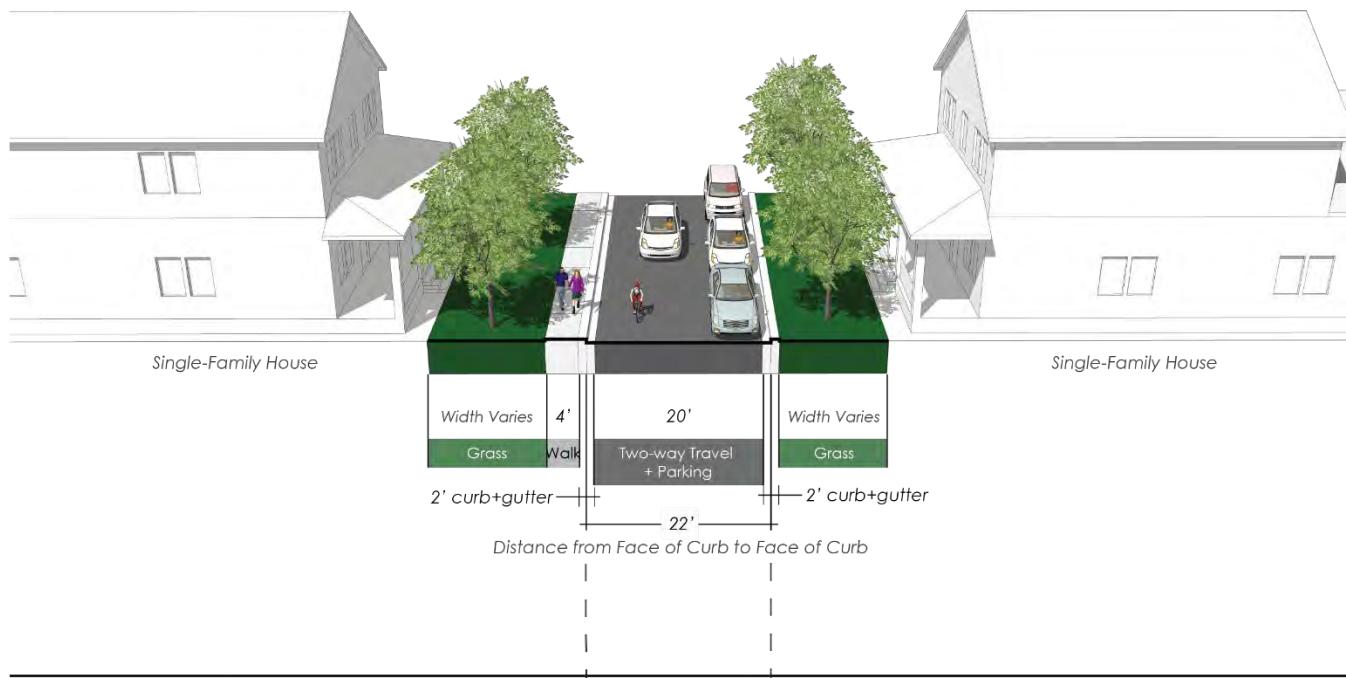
Recommended Typical Section for Tilbury Street (Cheltenham Drive to Chase Avenue)
